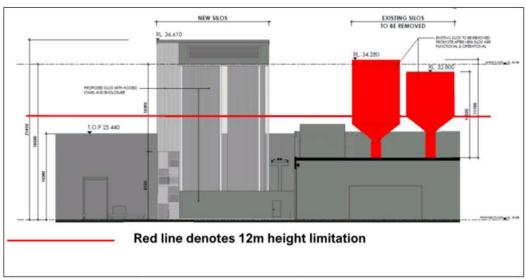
21.4 metre high silos approved under Determination No. DA/454/2020 at 104-108 Briens Road
